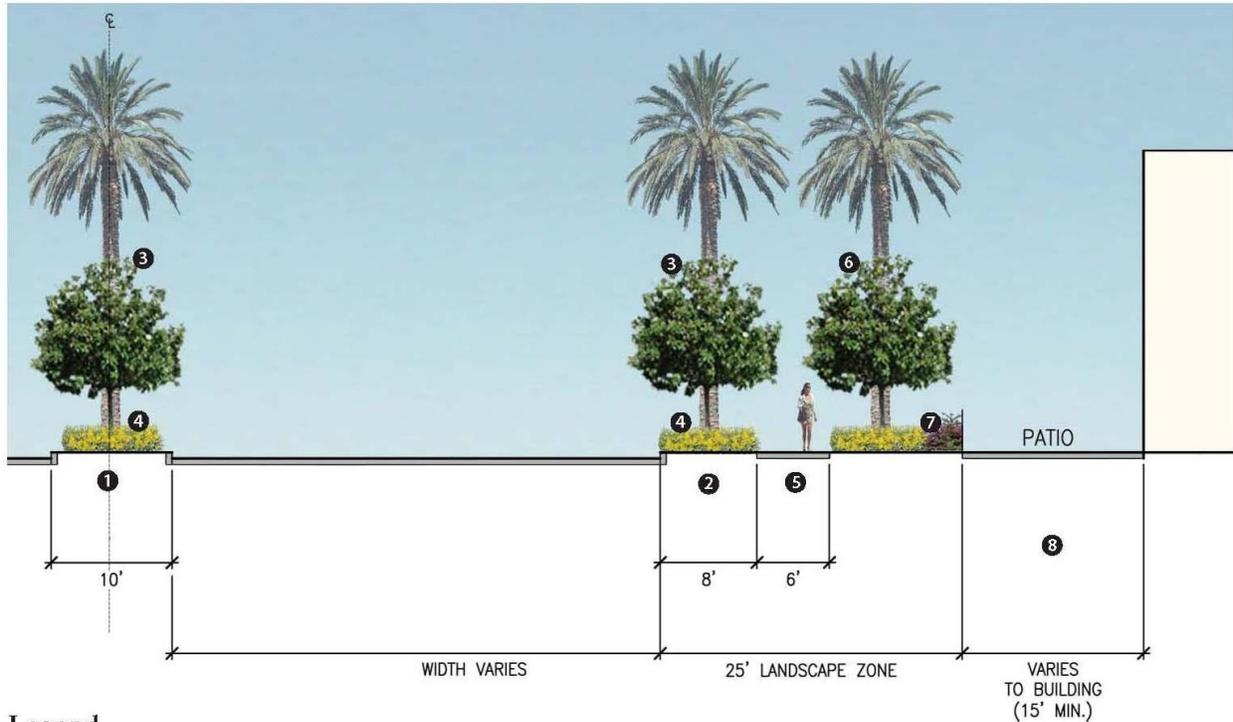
Murrieta Hot Springs Road Setback at Parking Lot with Bus Shelter
